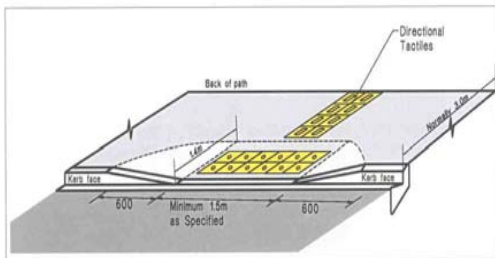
Standard kerb ramp design, assuming a full kerb height of 100mm.
